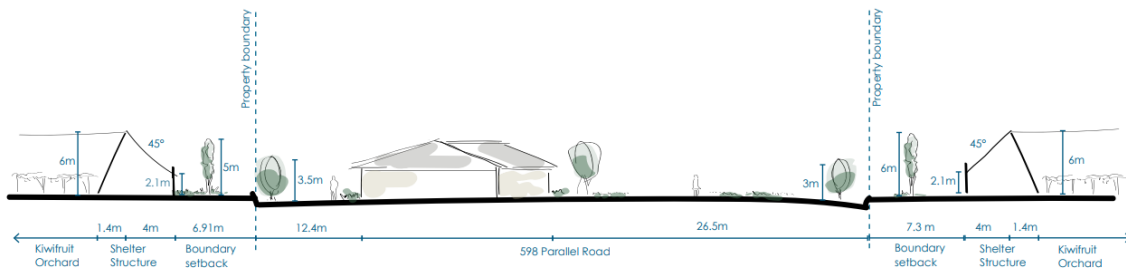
Southern Elevation Plan with Shelter Belt Planting Shown
